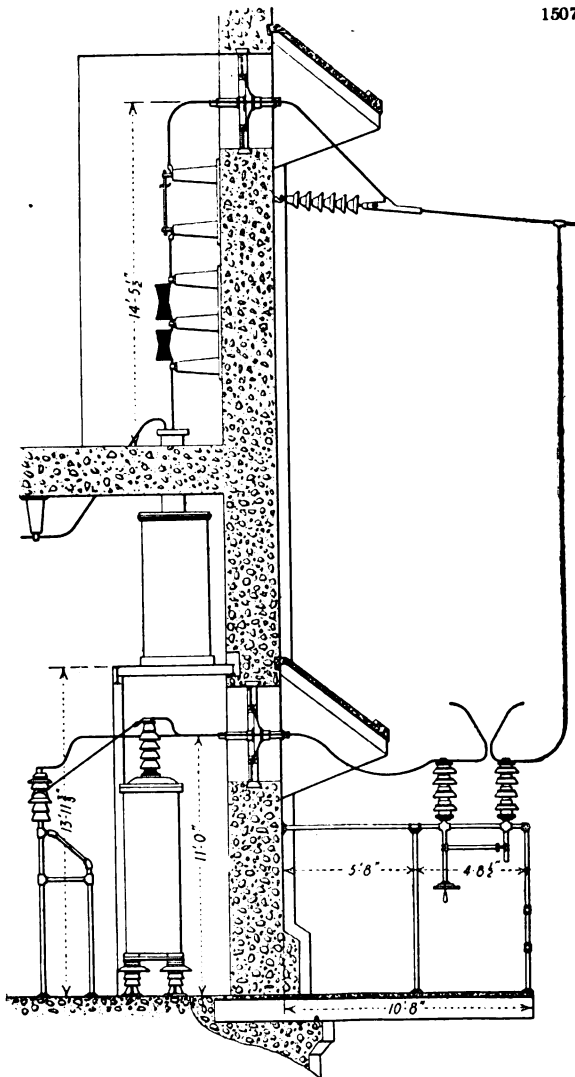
PENNSYLVANIA WATER AND POWER CO. CROSS-SECTION THROUGH TRANSFORMER HOUSE, SHOWING OUTGOING LINE
